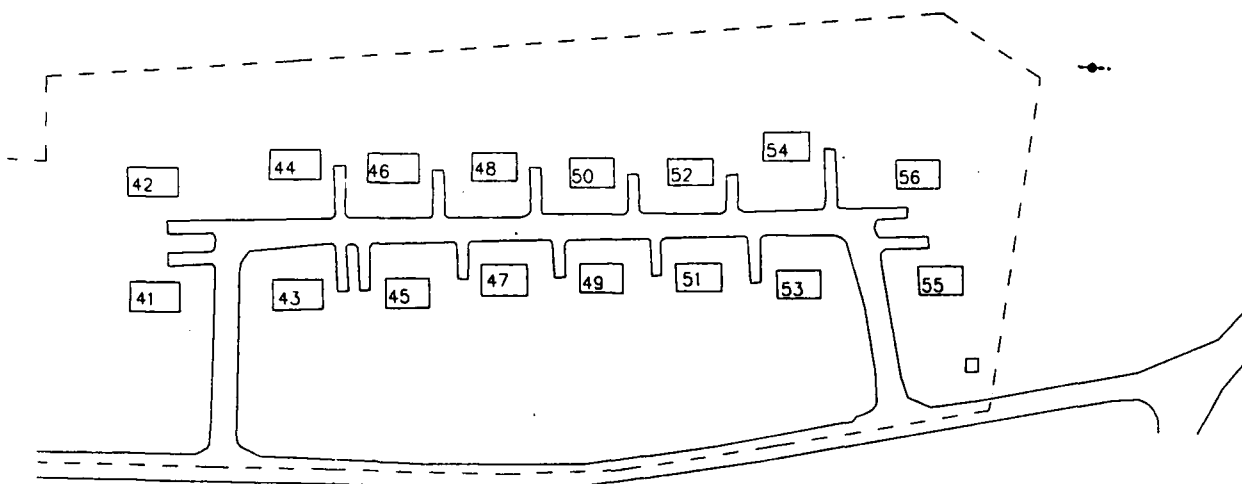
Site Plan Map of Irwin Army Housing Units
